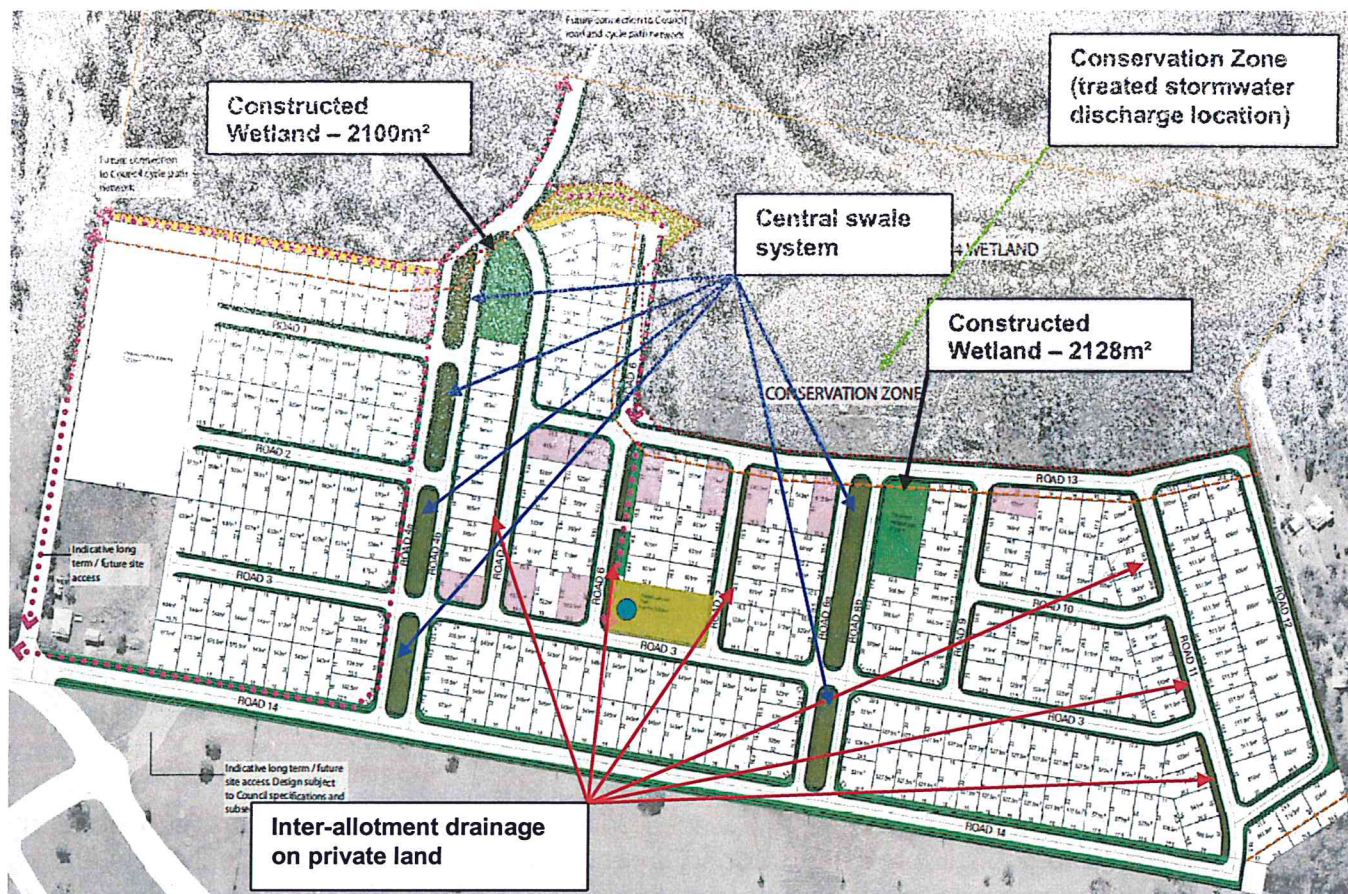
Stormwater Management Features – Approved Subdivision Plan
